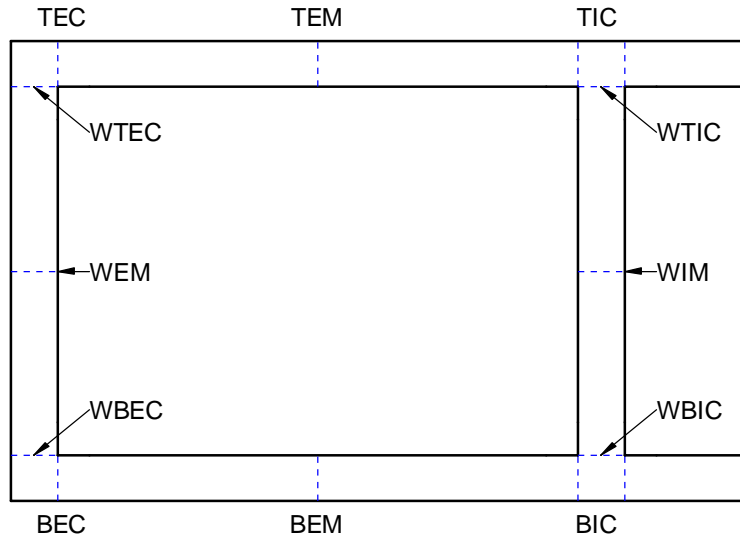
A. MOMENT CRITICAL SECTIONS FOR CULVERTS WITHOUT HAUNCHES.
